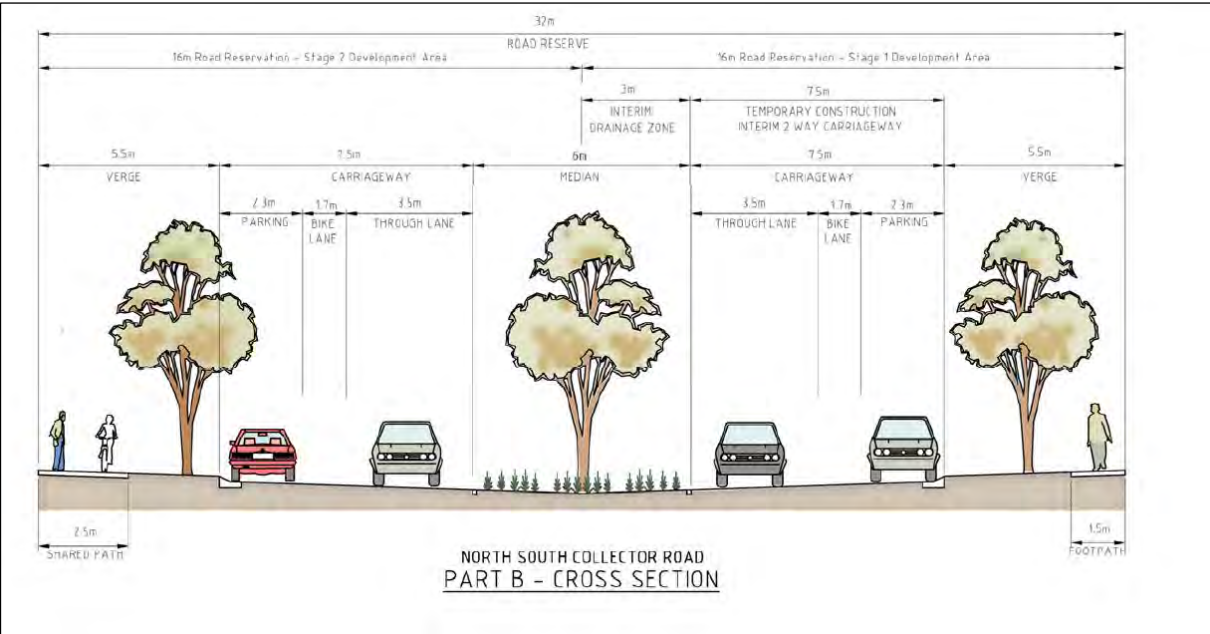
Previously Approved Ultimate Tivoli Drive/Greenvale Drive Cross-Section (north of Rail Trail)
